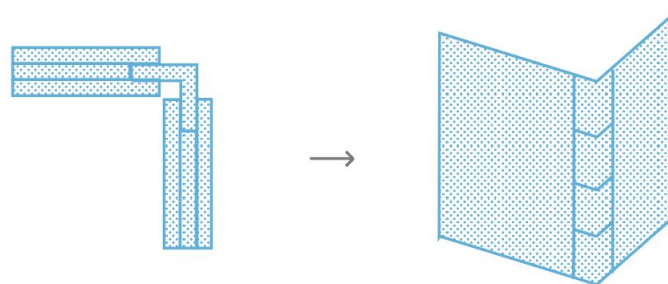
Design Example of the connection piece with overdimensioning and secondary load transfer mechanisms
